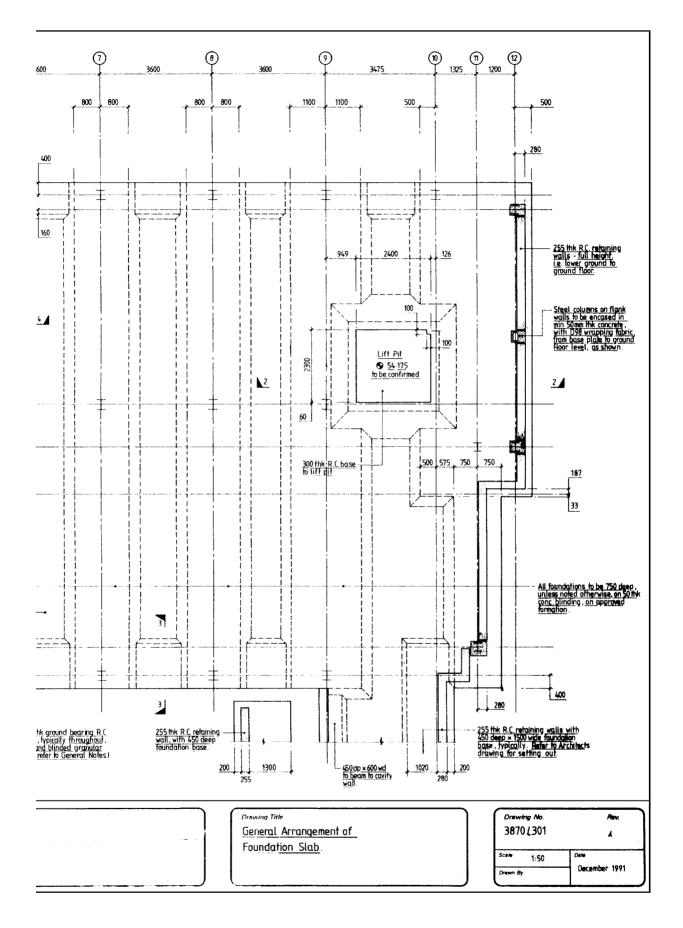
Drawing issued for tender purposes—general arrangement for foundation slab
